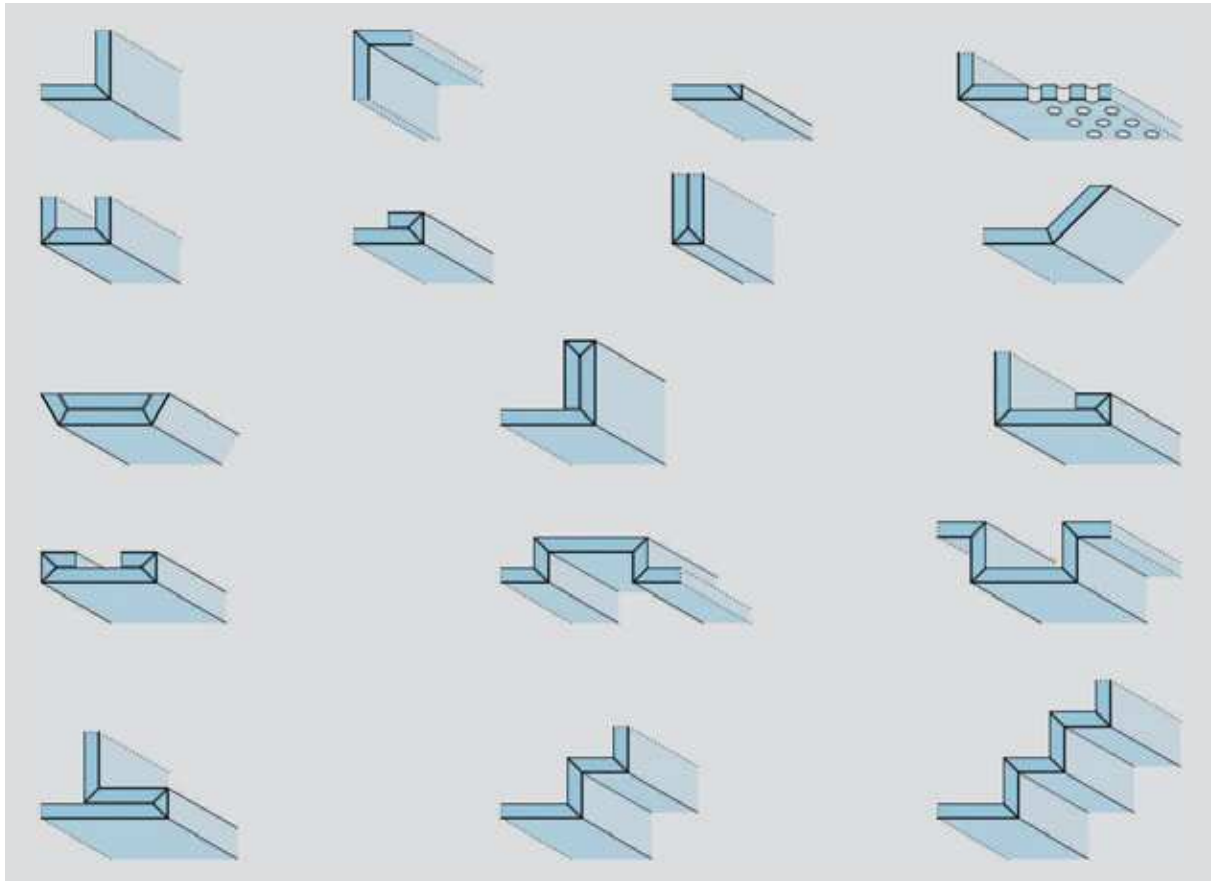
Mitred elements as design units (mitering technology) /Knauf Gips KG/
